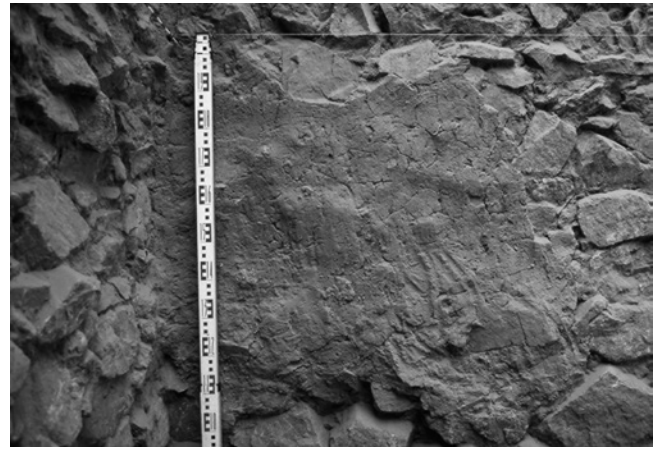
Banco coating in the process of being removed from the lower levels of the walls in the north-west corner of Ek-A, revealing the stone wall behind.
